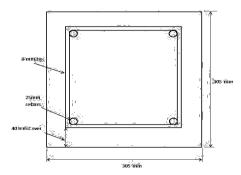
Cross-section of the concrete columns in the test performed by Kodur and Mcgrath [7].
